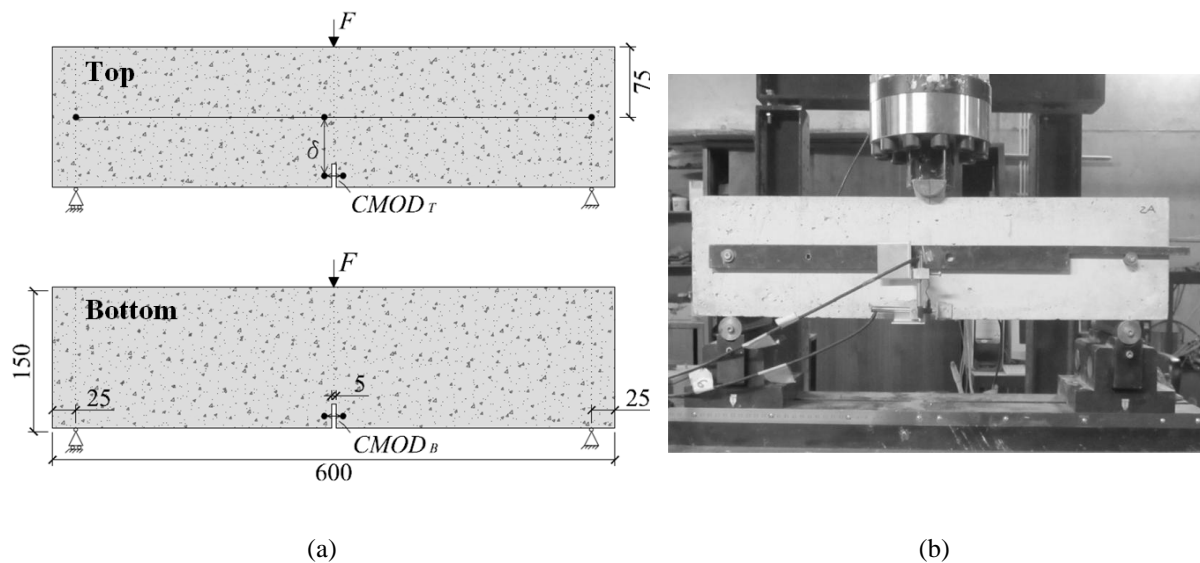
Test set-up of 3PBT: (a) schematic representation; (b) general view of top surface (units in millimetres; Top/Bottom: refers to the casting position of specimens).
